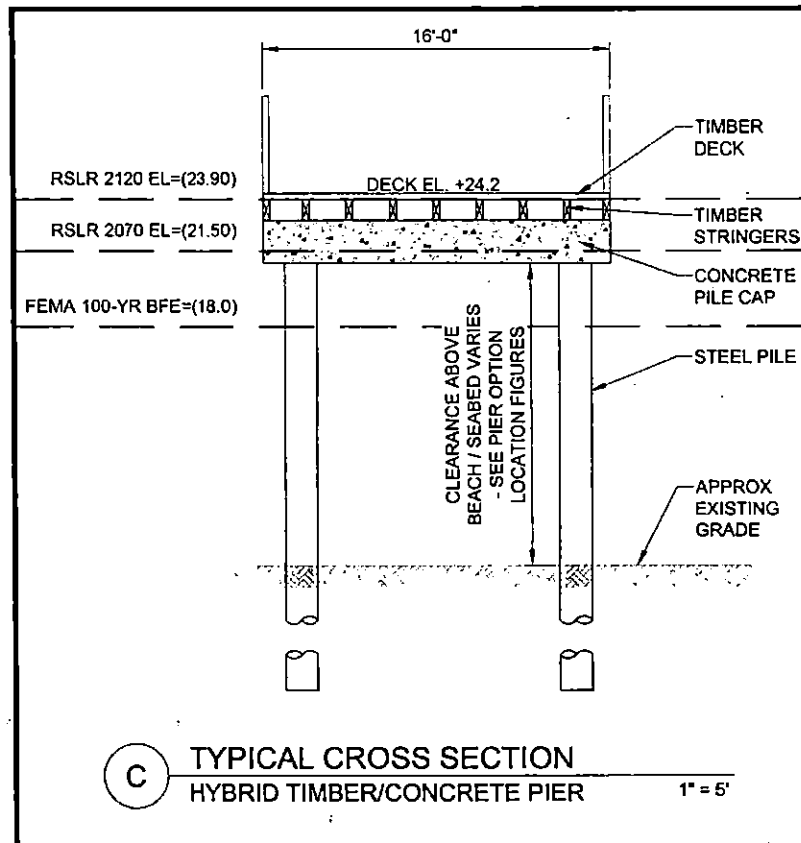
Proposed Hybrid Precast Concrete & Timber Pier Conceptual Cross Section
